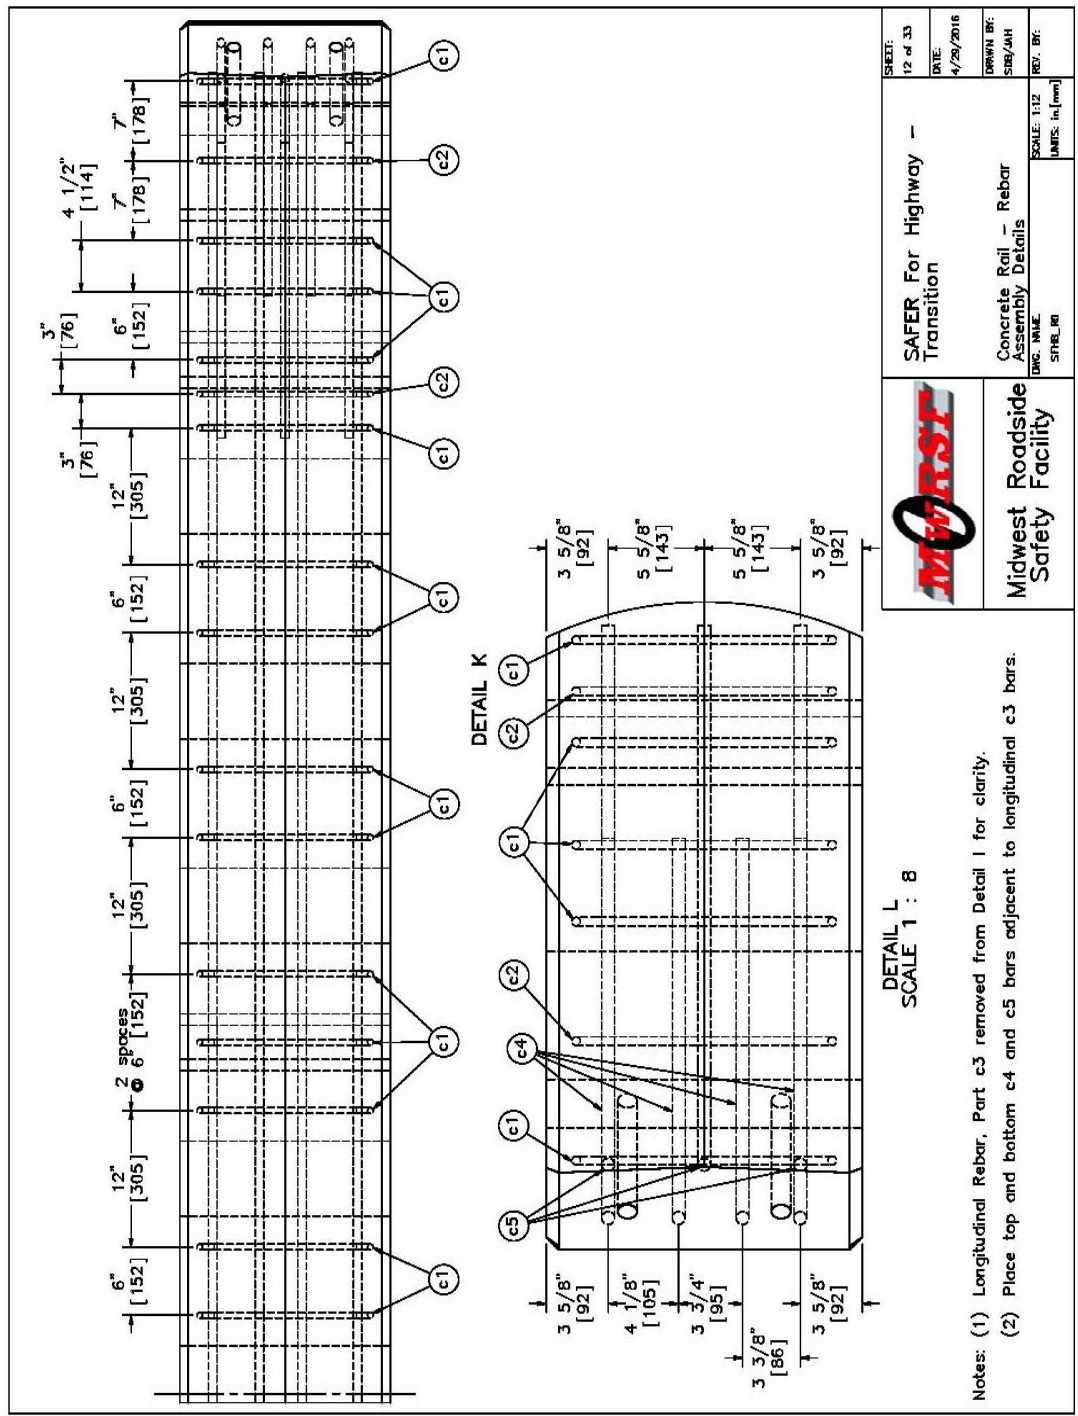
Concrete Rail Rebar Assembly Details, RESTORE Barrier Transition
